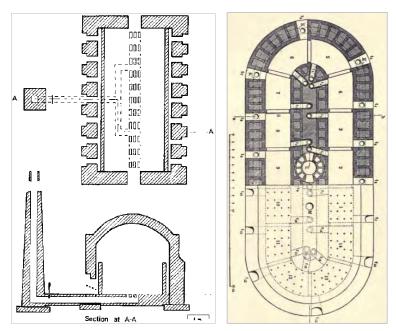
Plan and section of rectangular downdraught kiln (left) and Hoffman continuous kiln (right)
